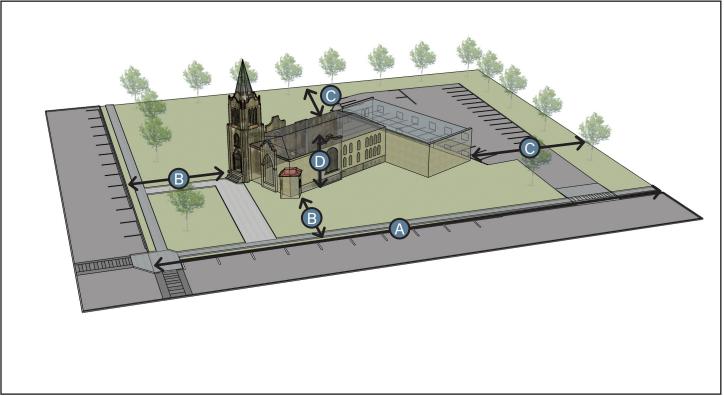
Graphic showing a potential development in RI. Note that the minimum front yard setback is applied to both street frontages. Also note that rear parking, street parking, curb bump-outs, and raised crosswalks add to neighborhood walkability. Also note that steeples are not included in building height; in the case of a church, measure to the midpoint of any pitched roof.
